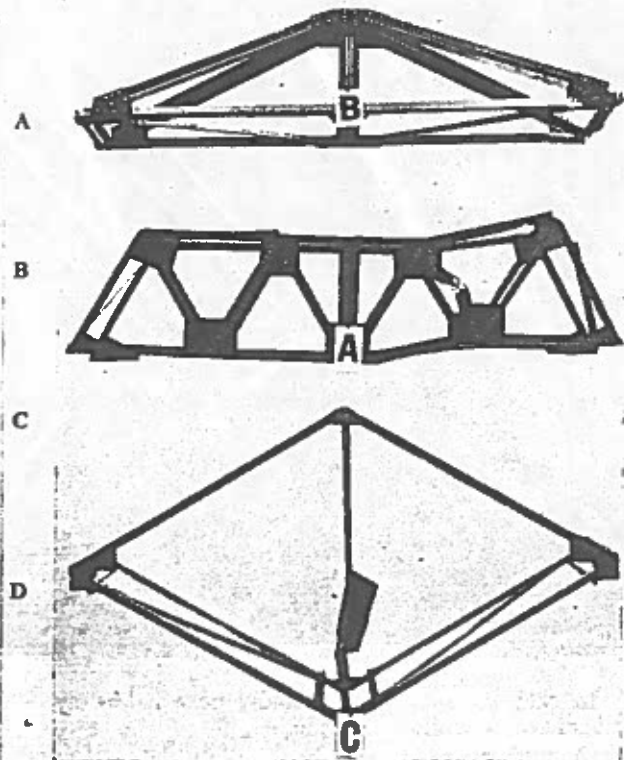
(Above)—FIRST YEAR DESIGNS: Problem No. 1 Cantilever truss, 32 in. over-hang, minimum collapse load 600 lb. Steel angle and pop-rivets.
